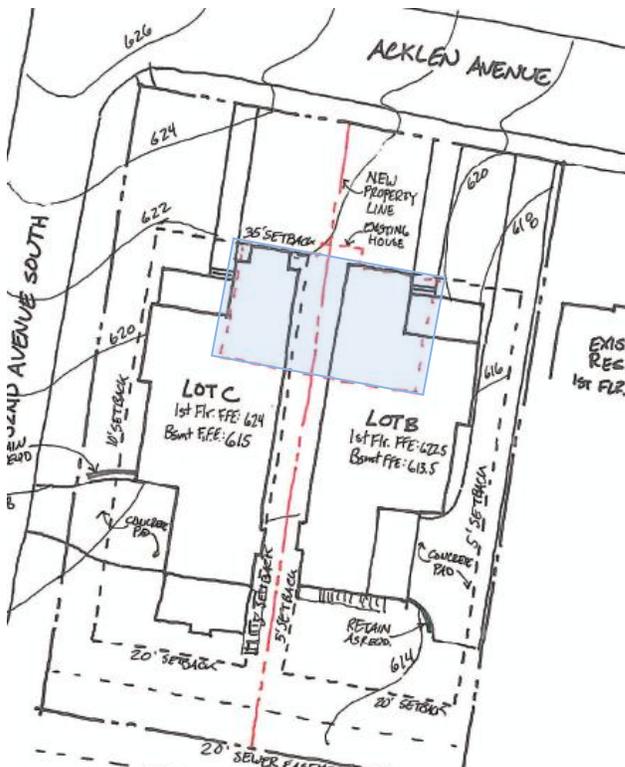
Site plan of new buildings. The existing house on the site is shown straddling the new lot line.
